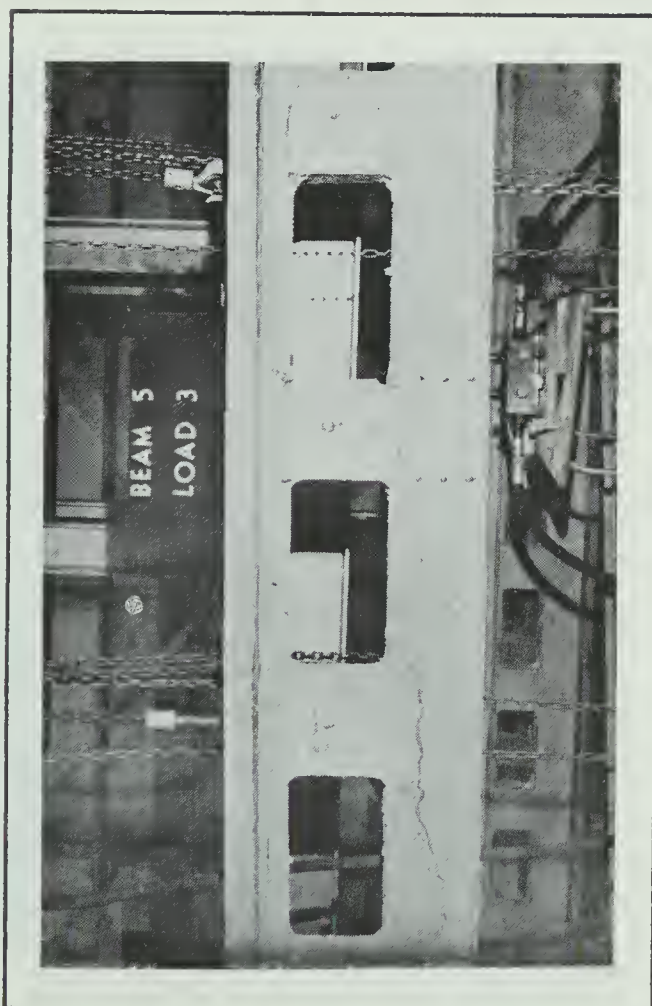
BEAM #5 CRACKING AND FAILURE PATTERNS
